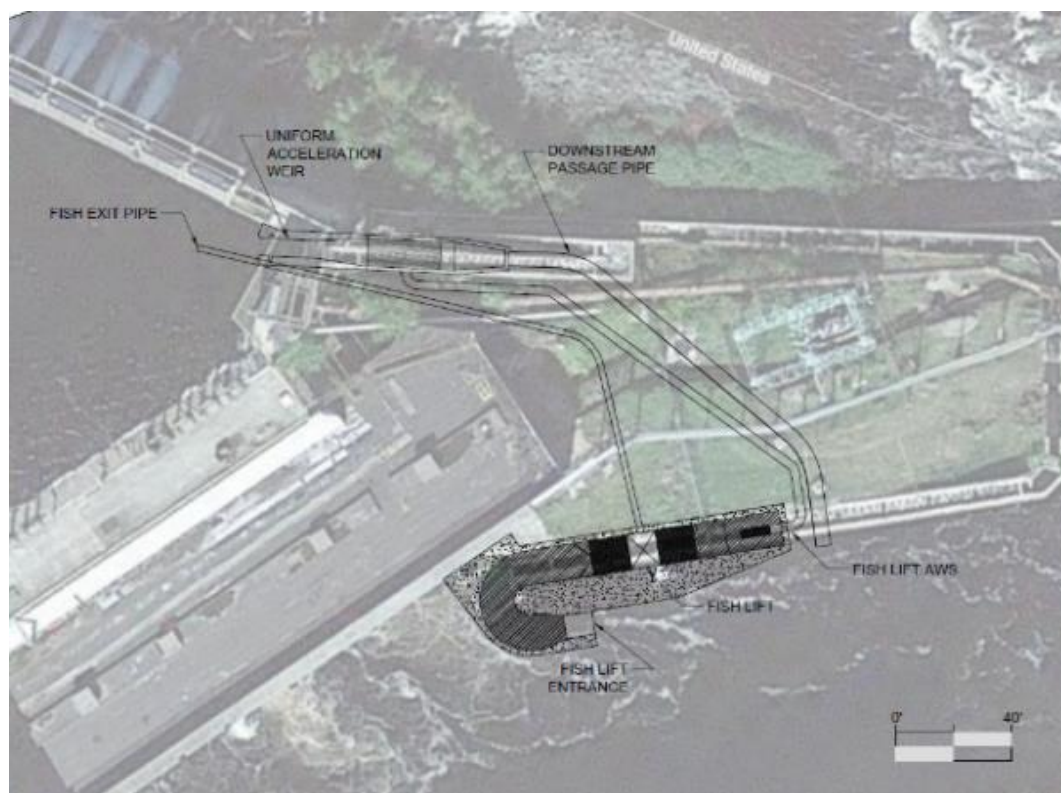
Conceptual plan for a fish lift at Woodland (source: Alden Labs)
